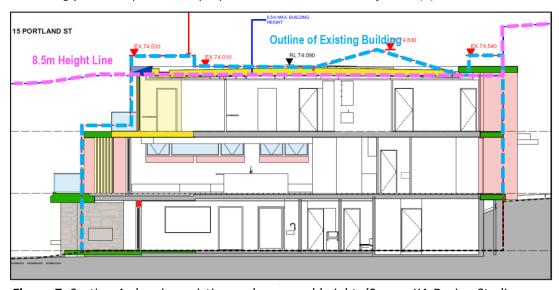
Section A showing existing and proposed height. (Source KA Design Studio, 2022)
